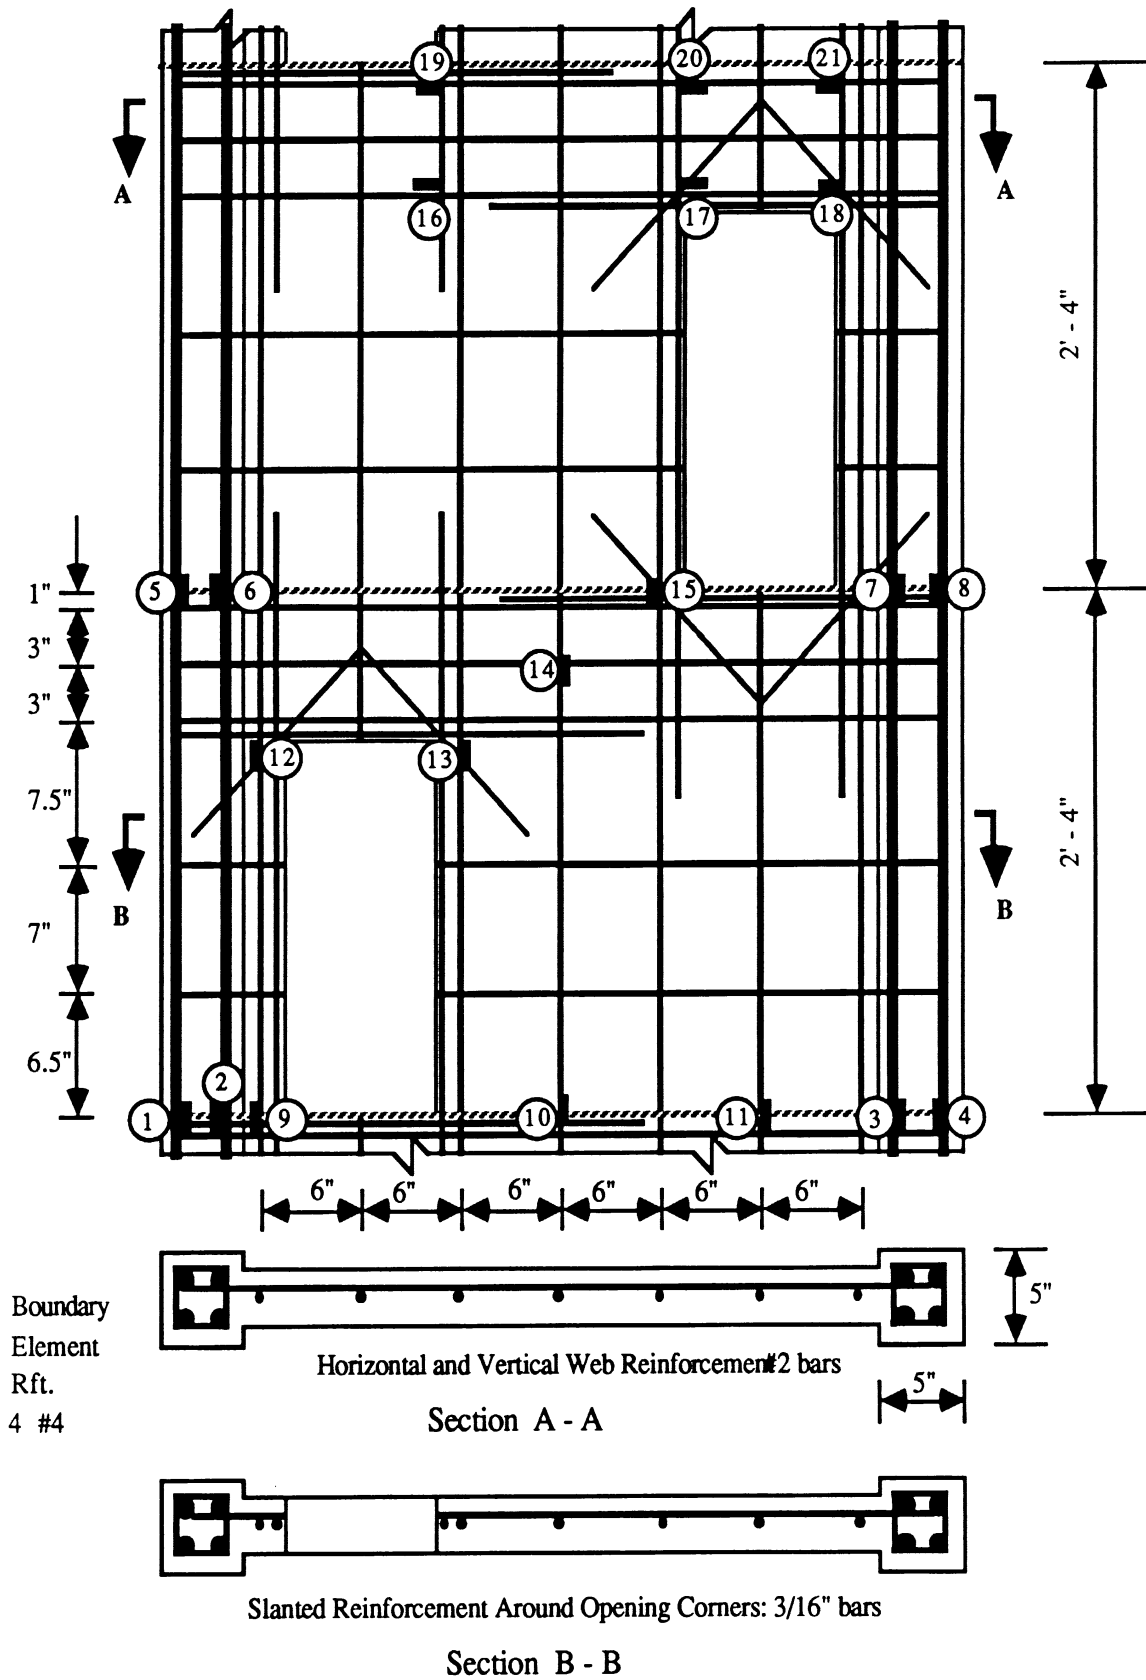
(b) : Wall Elevation with Gage Locations and Cross Sections of Specimen W-2.
